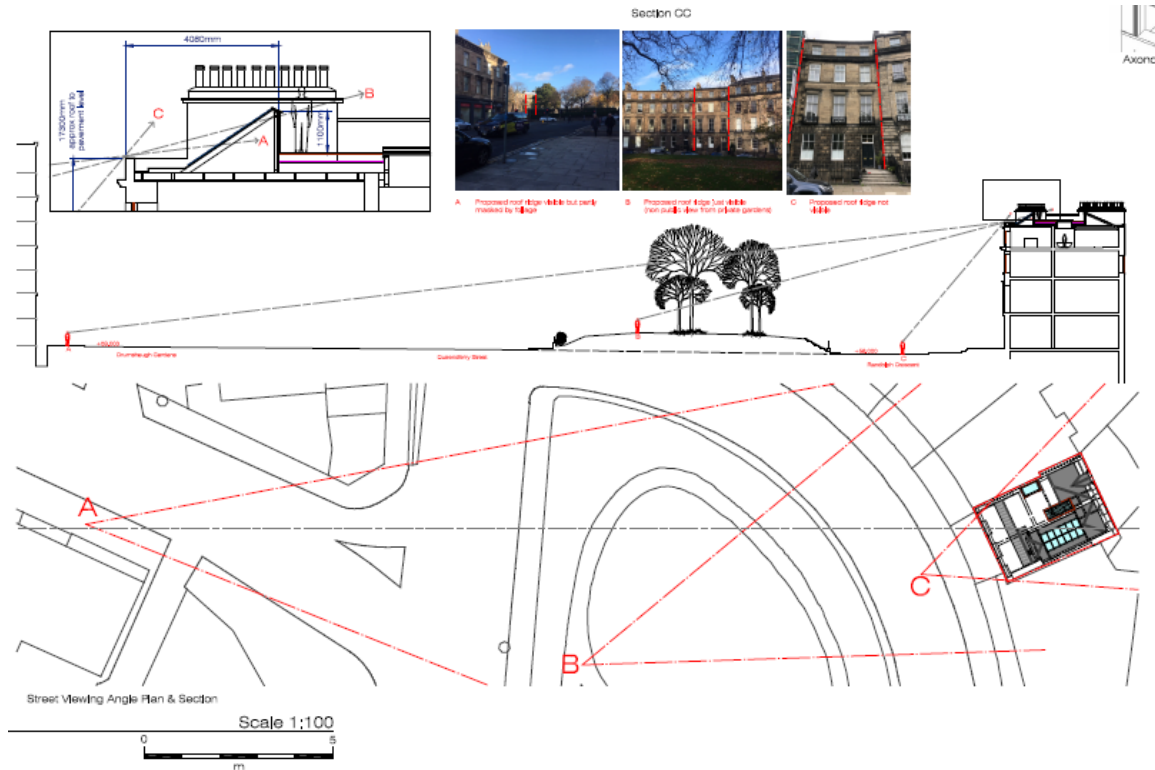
above: Viewpoint Locations (Richard Manson Architects) – Please refer to supporting information for full scale plan and image.
